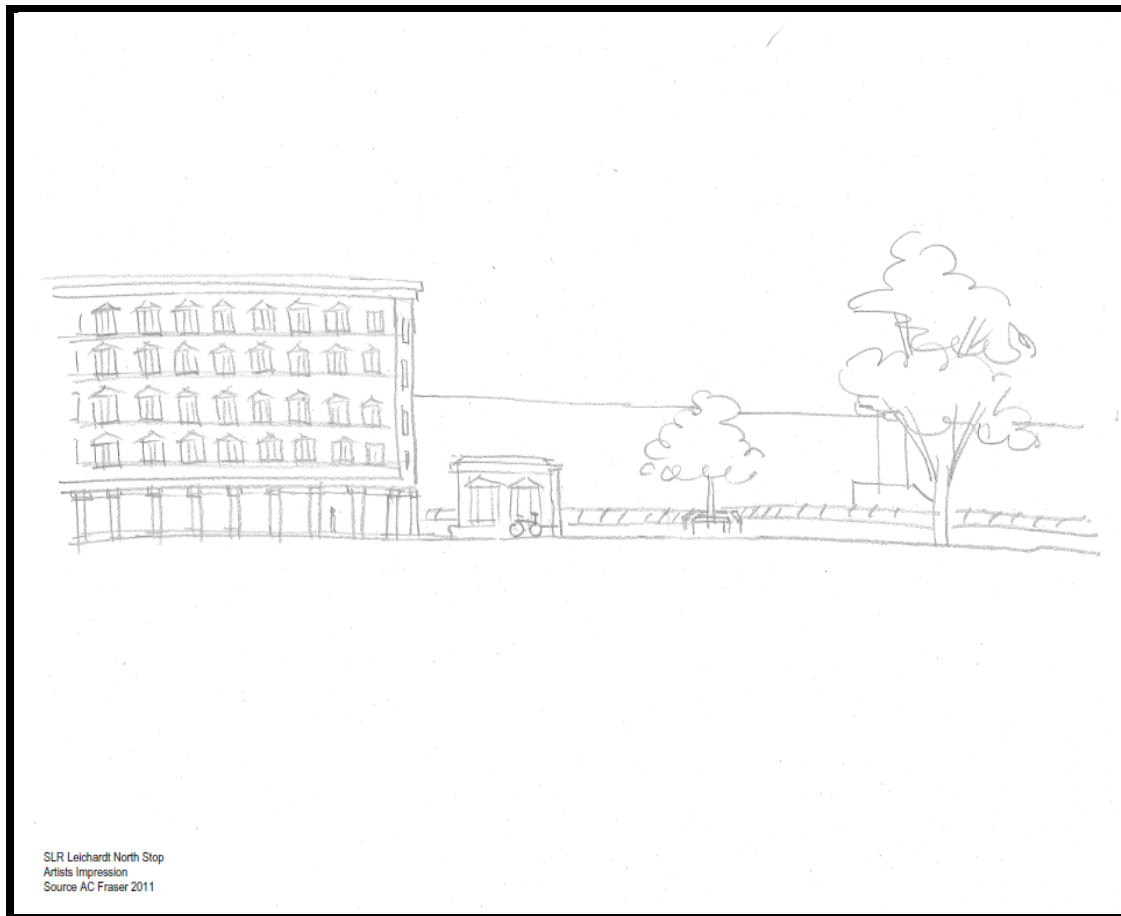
, Artist's Impression of Leichhardt North Stop Building and surrounding area
